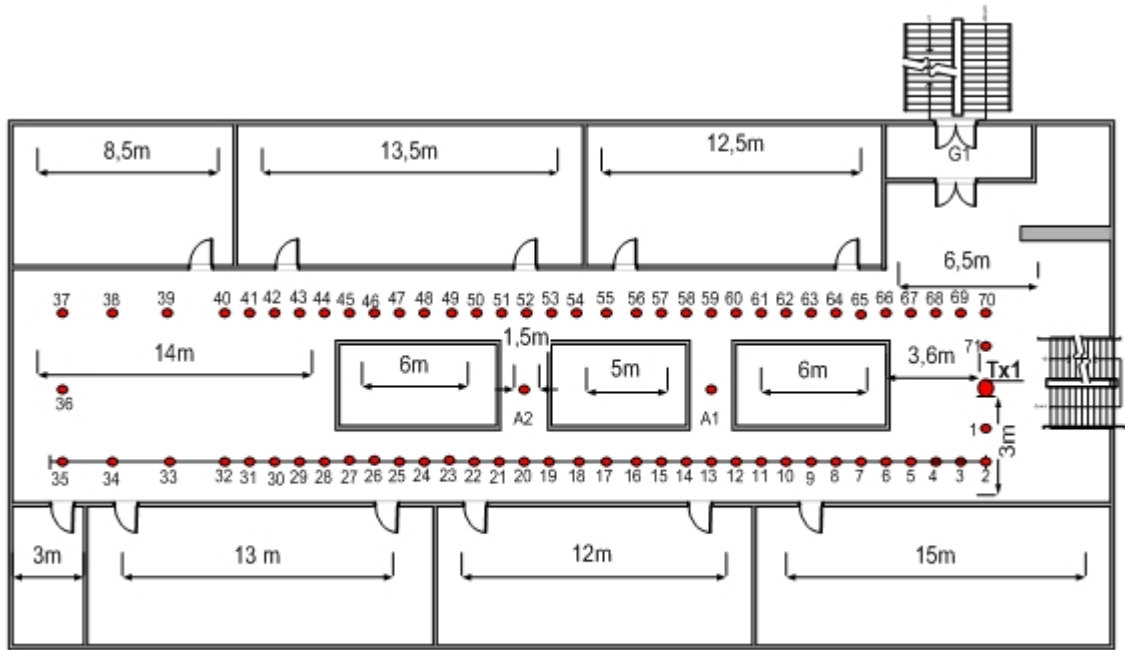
The layout of ground floor showing the transmitter position and the measurements points.
